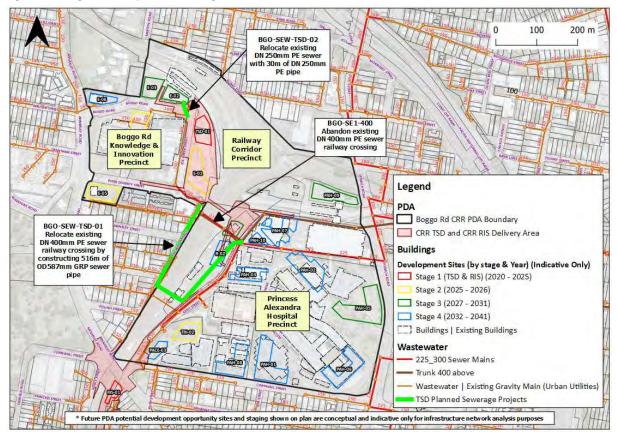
Existing and Currently Planned Sewerage Infrastructure
